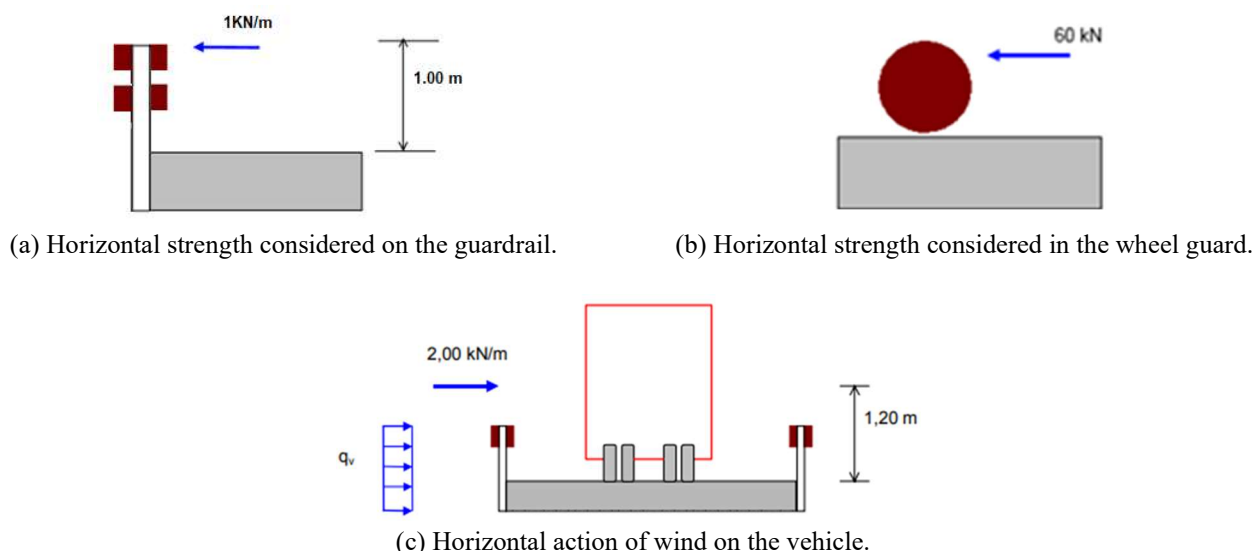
Suggestion of guardrails and wheel guards for bridges with a deck of sawn planks and round beams and wind action on the vehicle.
